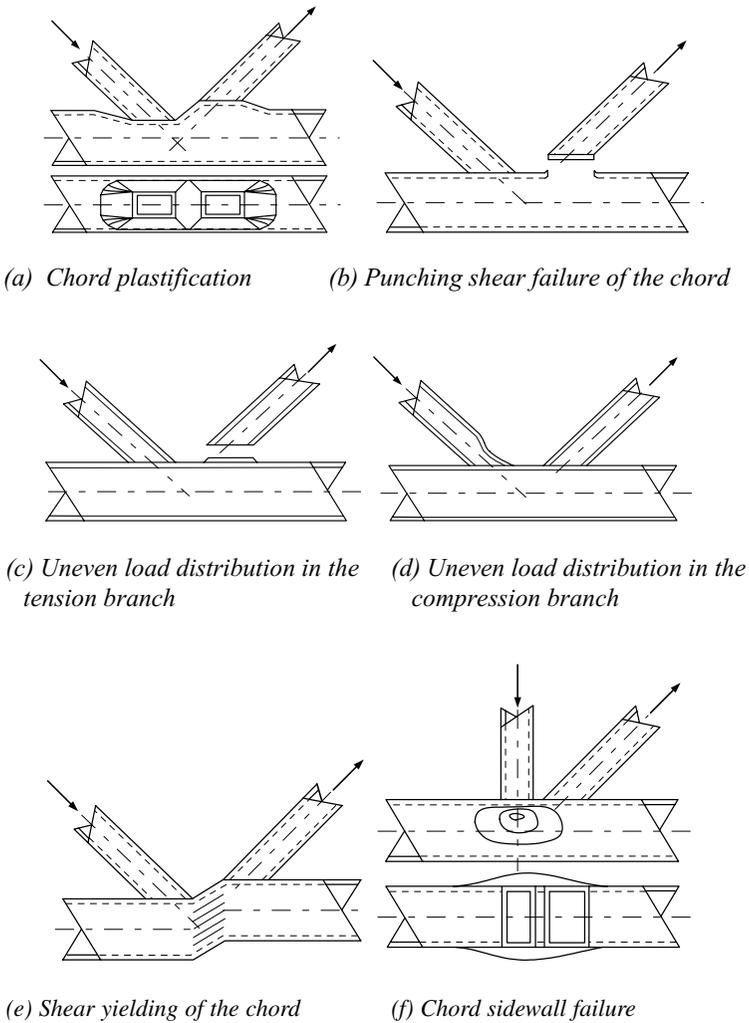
Typical limit states for HSS-to-HSS truss connections.
